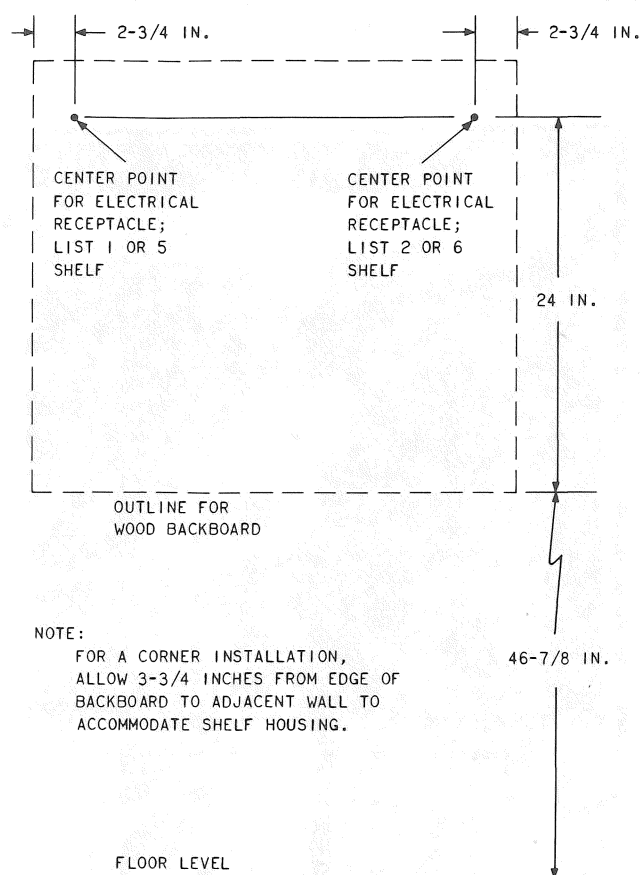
Locating The Hole For Electrical Receptacle Behind Backboard
